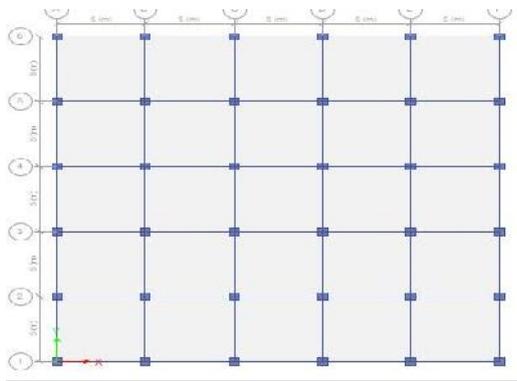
model 1: normal Building – plan view Fig.5 model 2: Floating column Building – plan view
